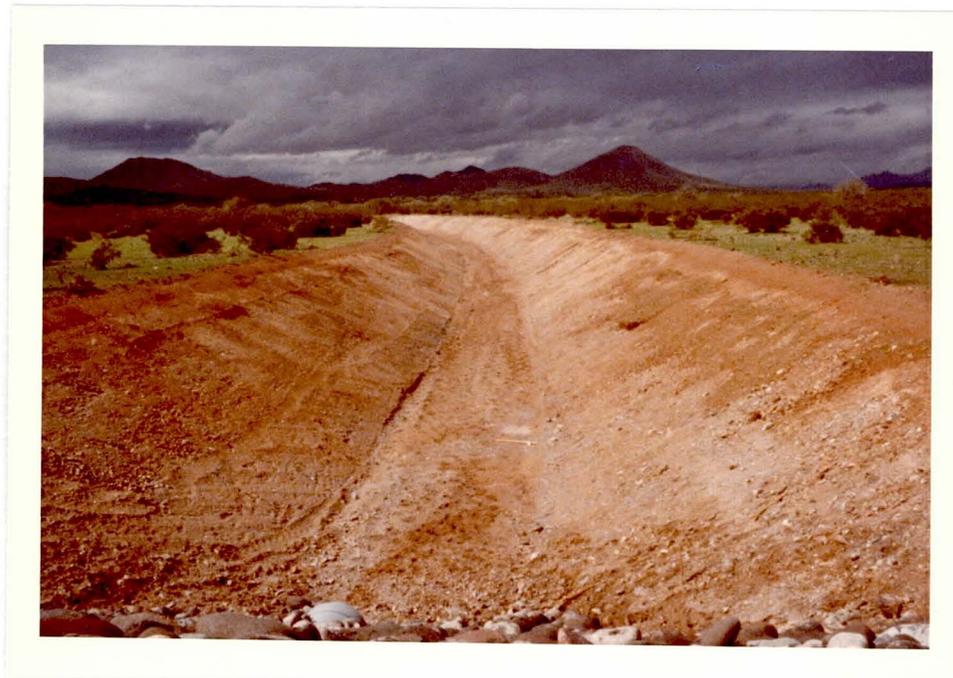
Diversion Channel from Dike No. 2. View looking NW from access road.
